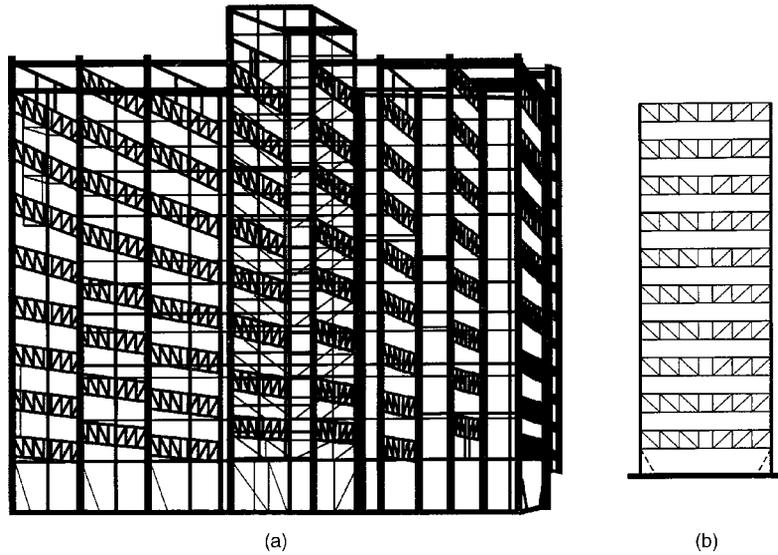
Staggered-truss system. (a) Story-high trusses are erected in alternate stories along alternate column lines. (b) Typical vertical section through building.
